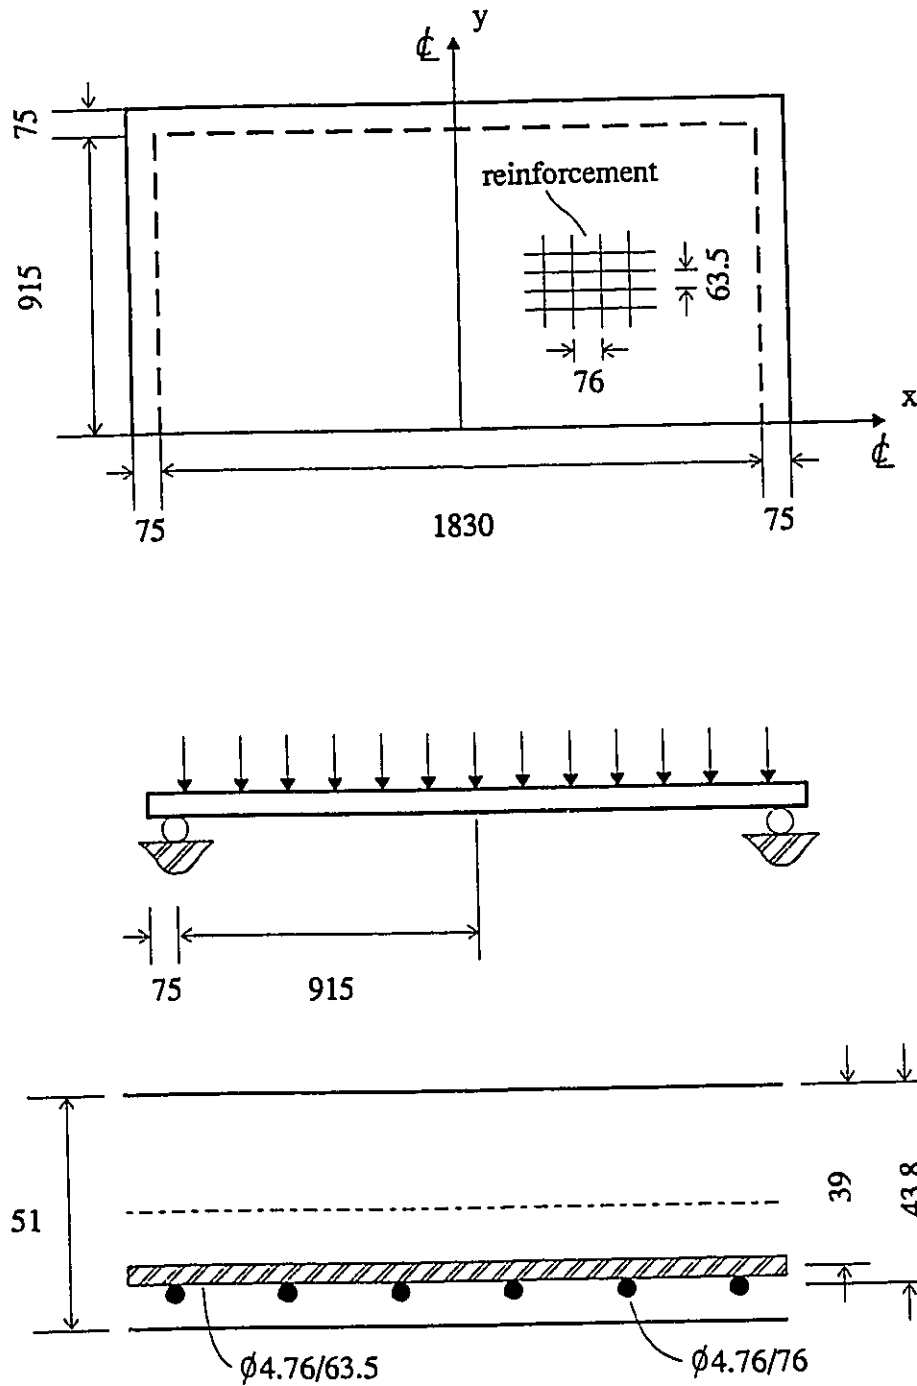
Geometry and reinforcement details for simply supported reinforced concrete slab (dimensions in mm).
